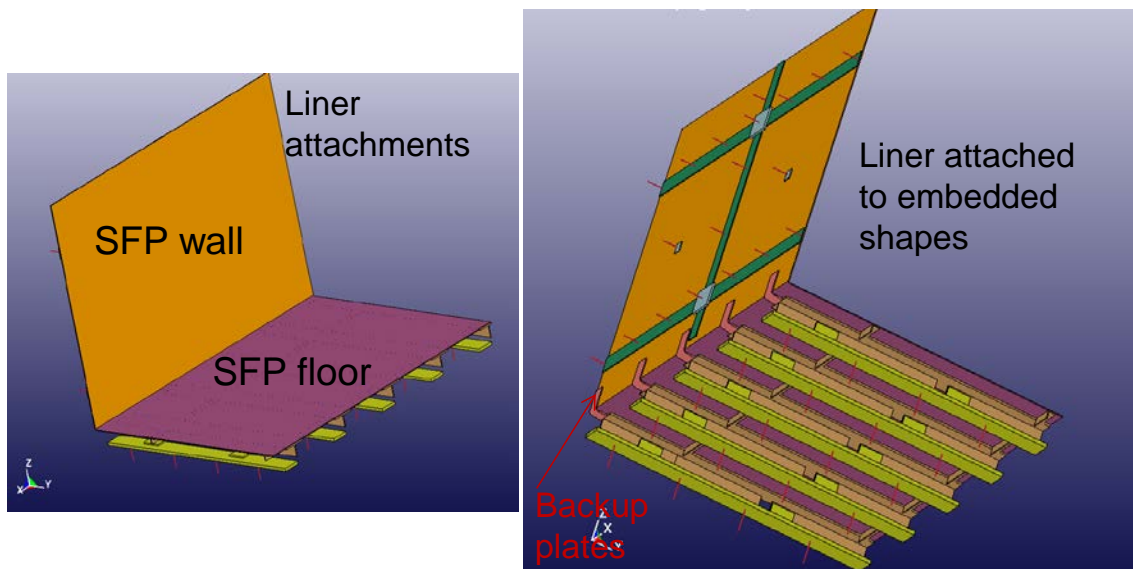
Finite element model of the SFP structure with labels for the floor and walls
